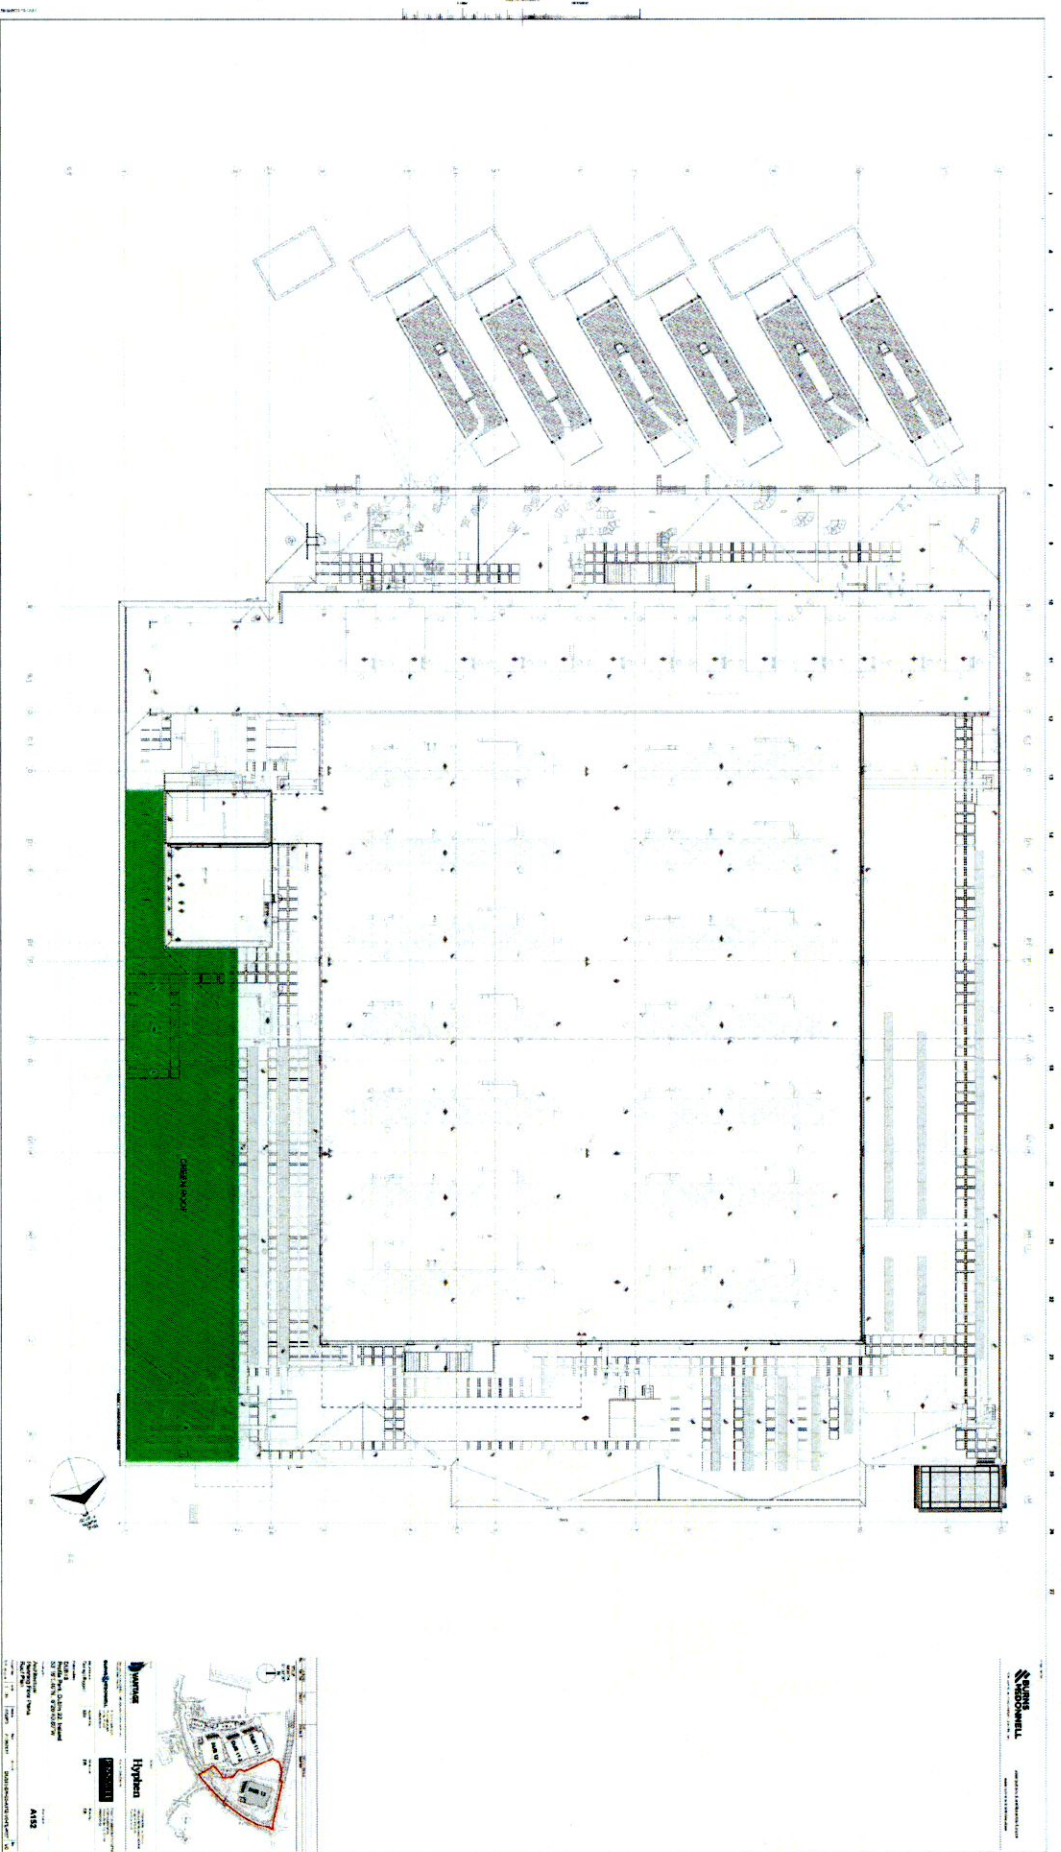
Proposed Roof General Arrangement Plan (Source Burns & McDonnell)
